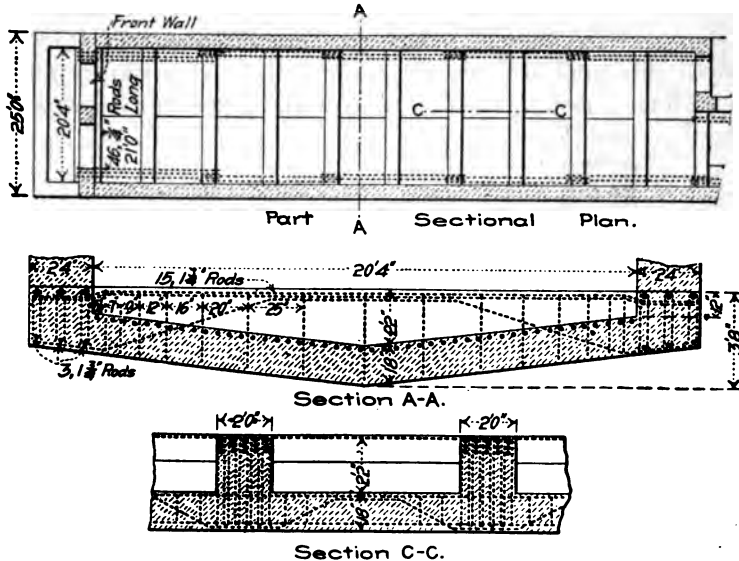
Foundation for C. C. Shayne Store, New York.
